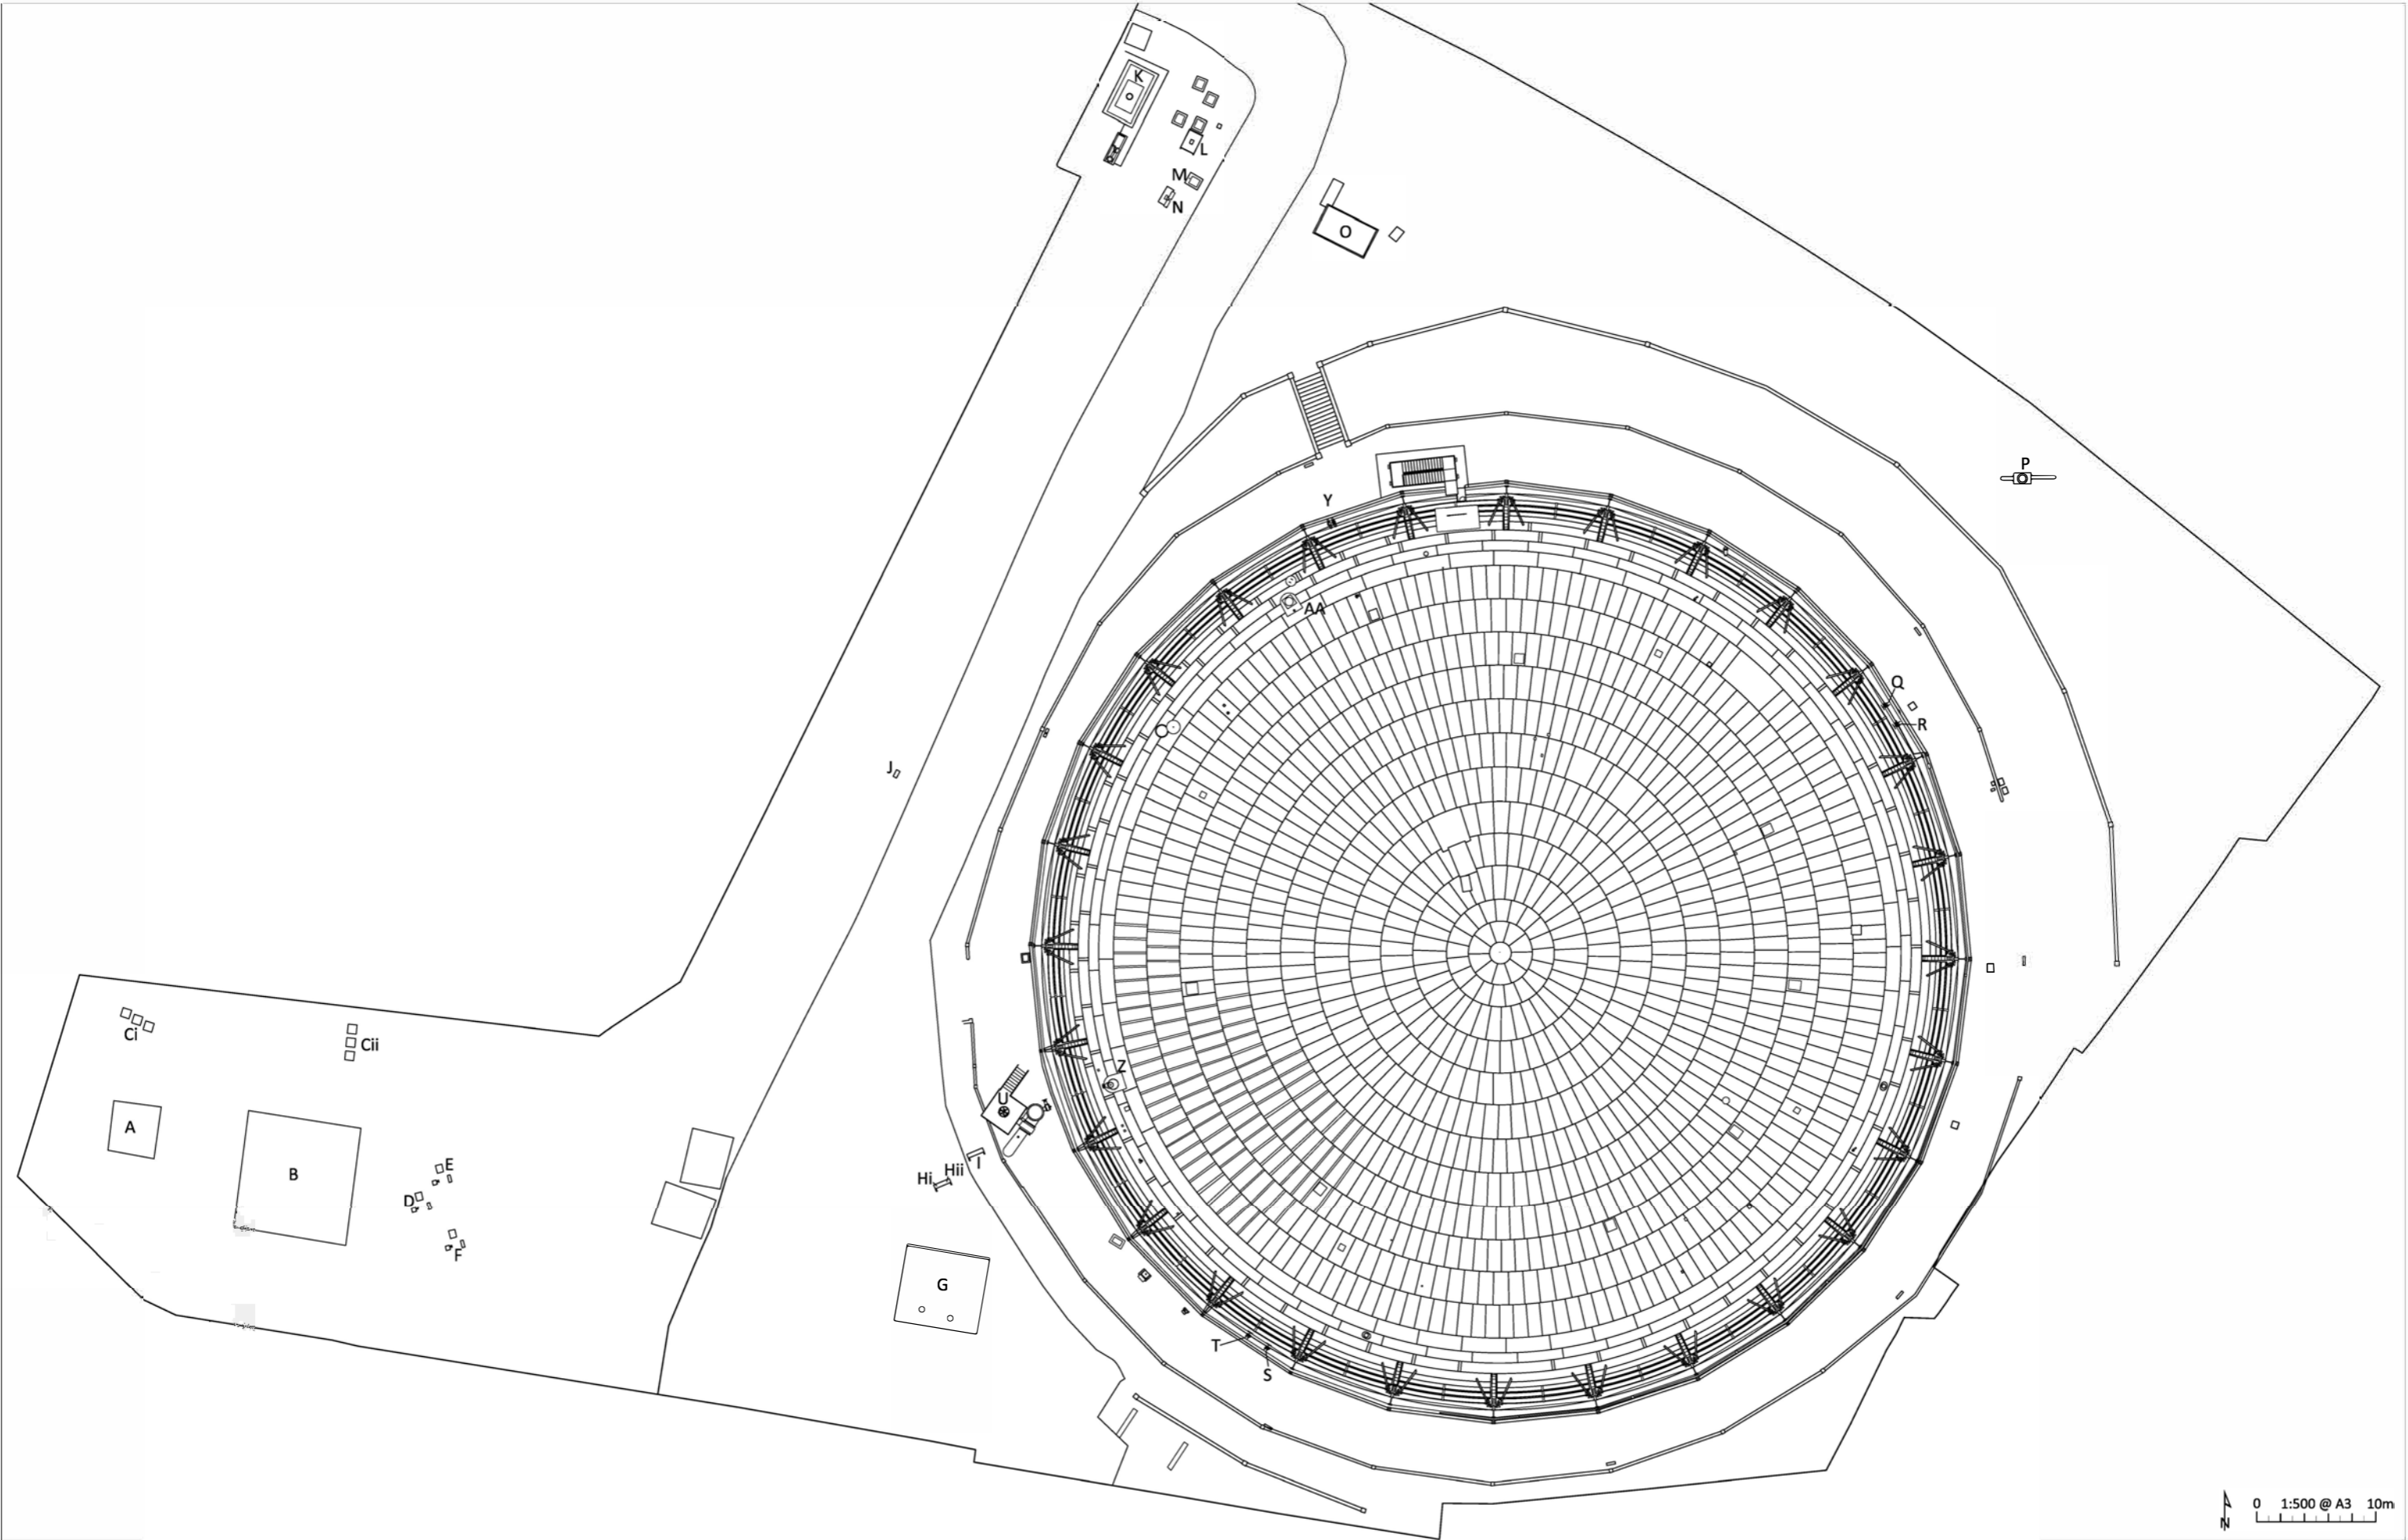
Blackwall Lane, Greenwich, Gasholder No 1, Site Plan
